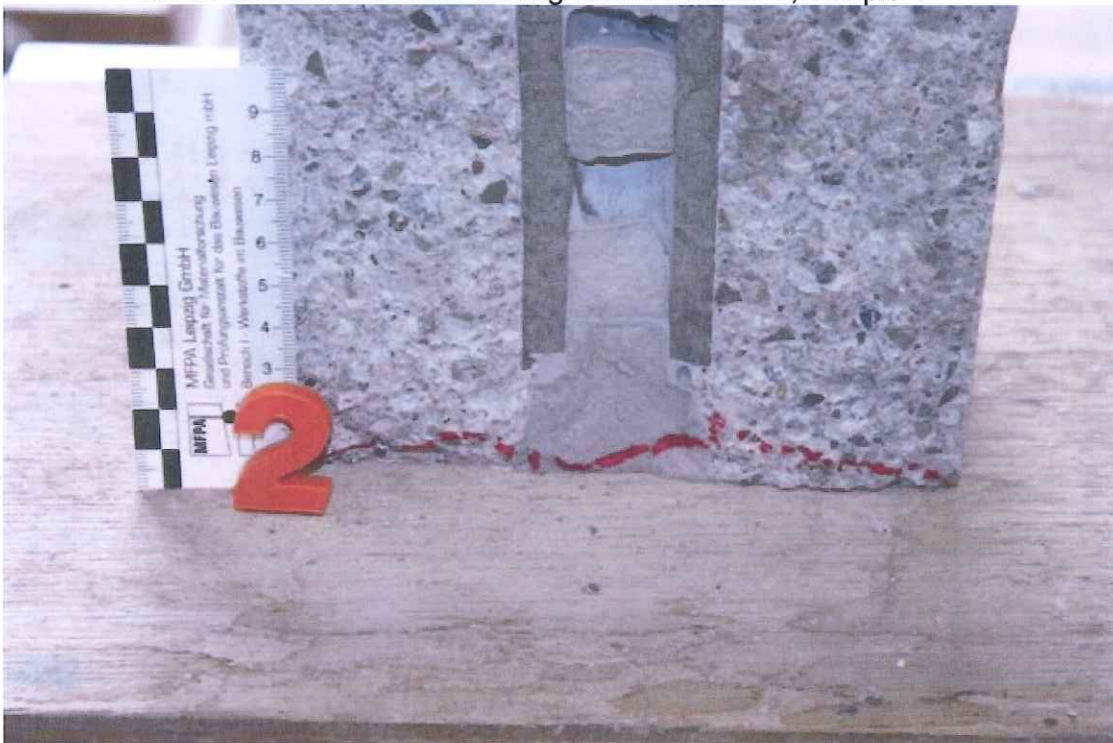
Series C 'FRANK fibre-reinforced concrete distance tubes – MR 22 sealed with one fibre-reinforced concrete plug St220020 and one 3 cm fibre-reinforced concrete sealing cone FBVKZ22T, sample 2
